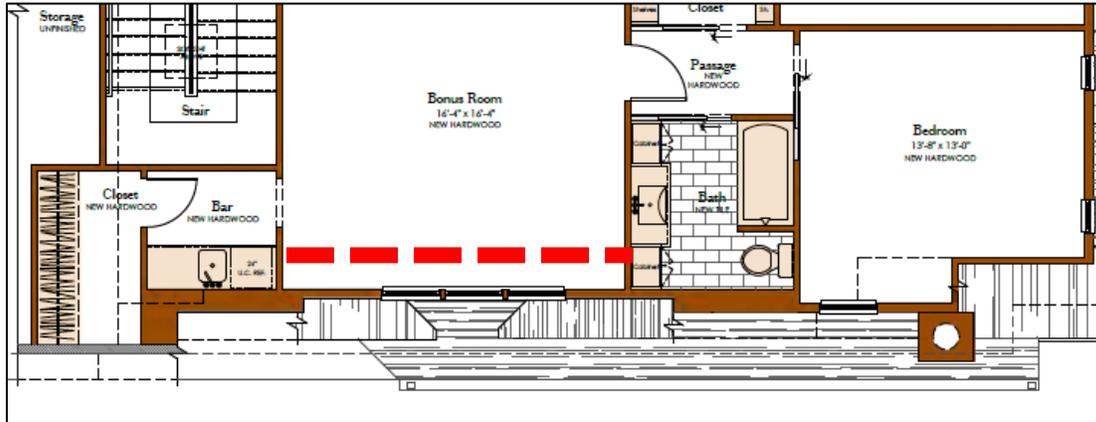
Second story floor plan. Dashed line indicates Staff's proposed relocation of the exterior wall.
